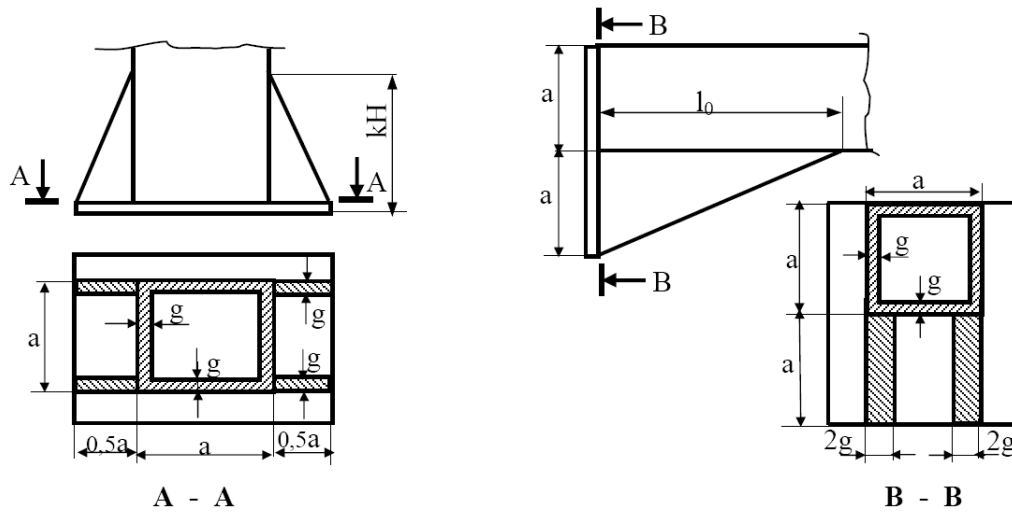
Schematization of the constructive solution caisson stiffened with gusset type
